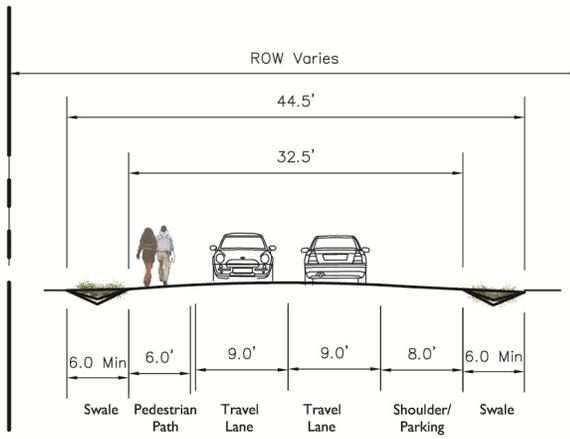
PROPOSAL A PROPOSED SECTION
